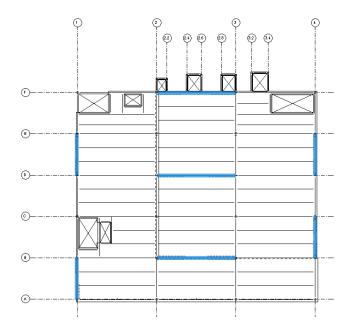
PLAN OF LATERAL FORCE RESISTING FRAMES
